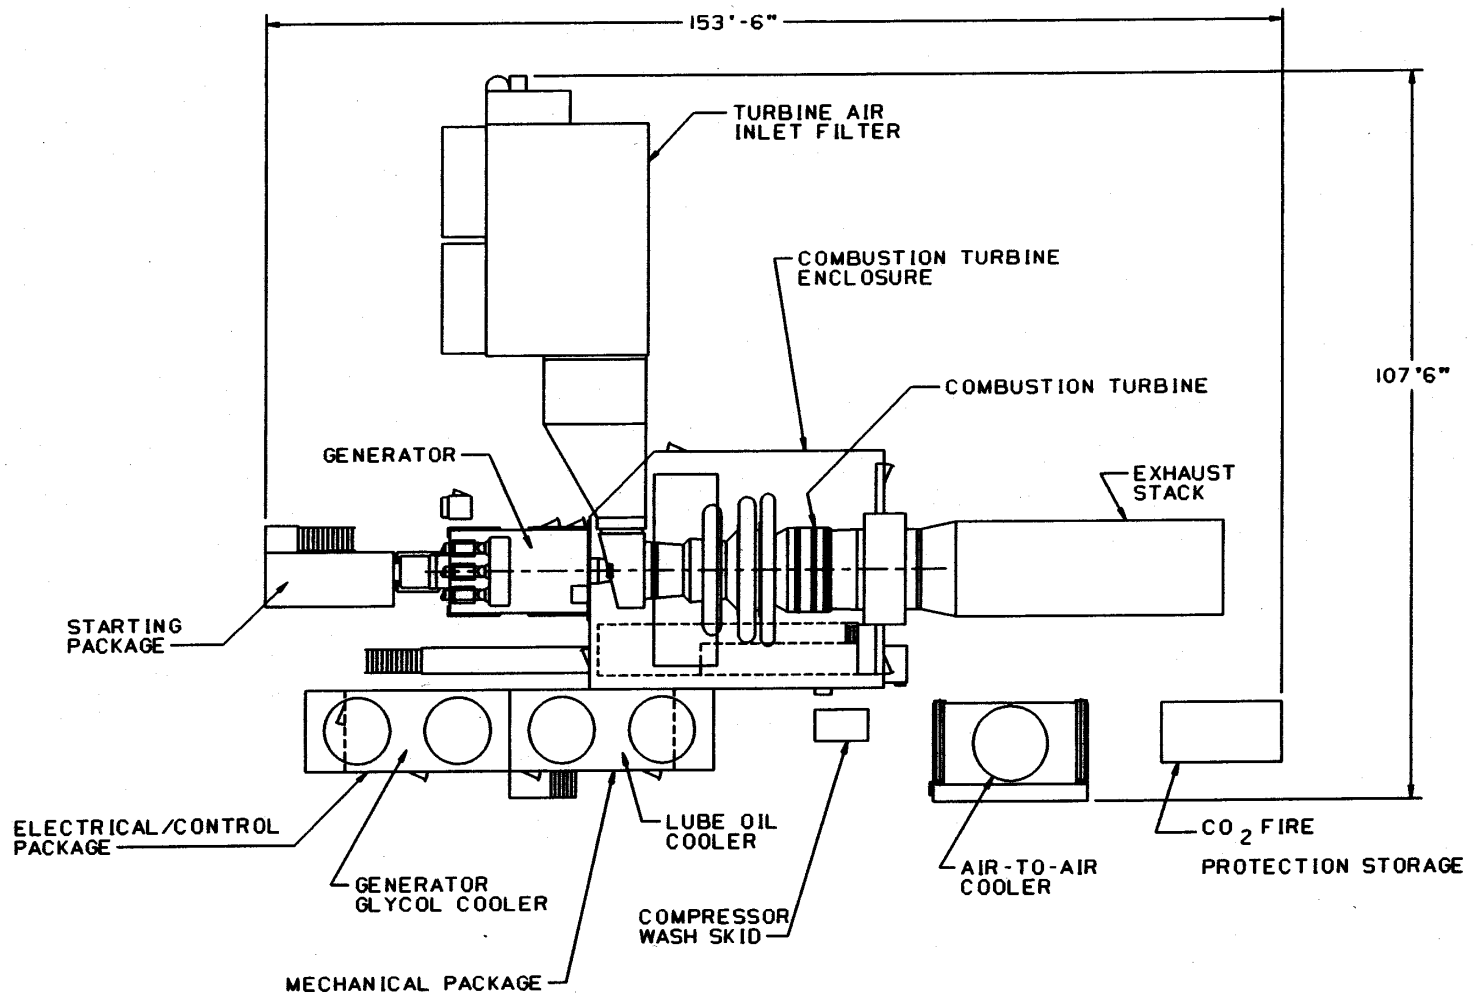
Plan View of Gas Turbine Installation
